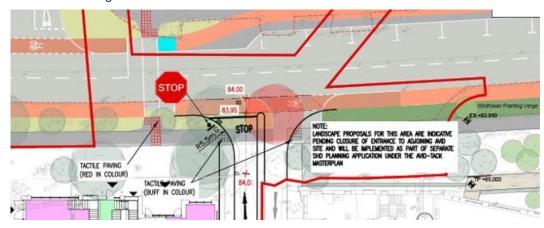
Junction 5: Site Access – Carmanhall Road (Traffic lane widths 3.0m internal and 3.25m external)
